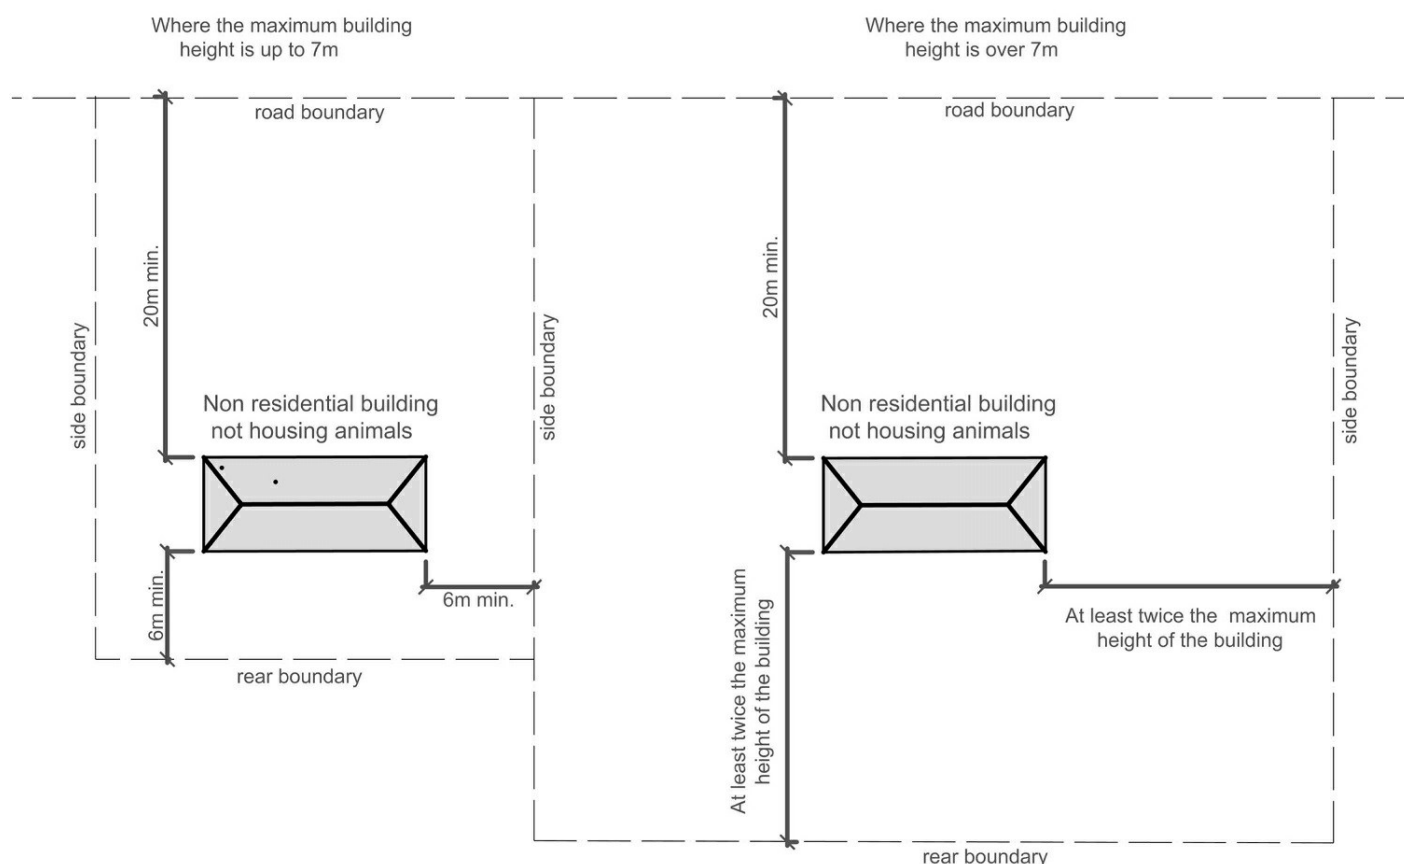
C: Setbacks for non-residential buildings not housing animals
